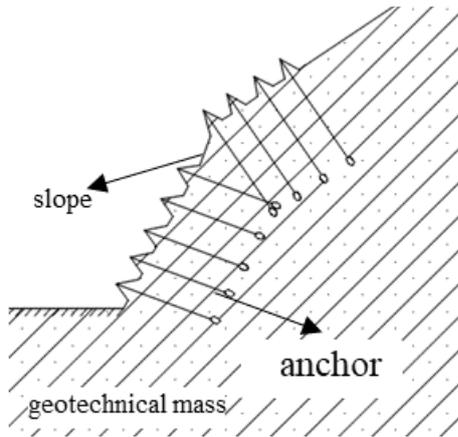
Anchors in the consolidation of slopes – soil nailing. Adapted from [12]
